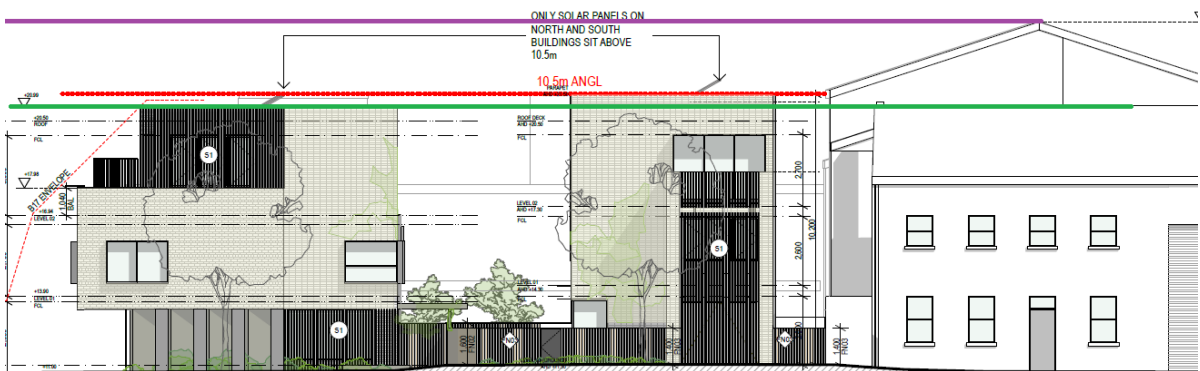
West Streetscape Elevation (Applicant submission, December 2021)
